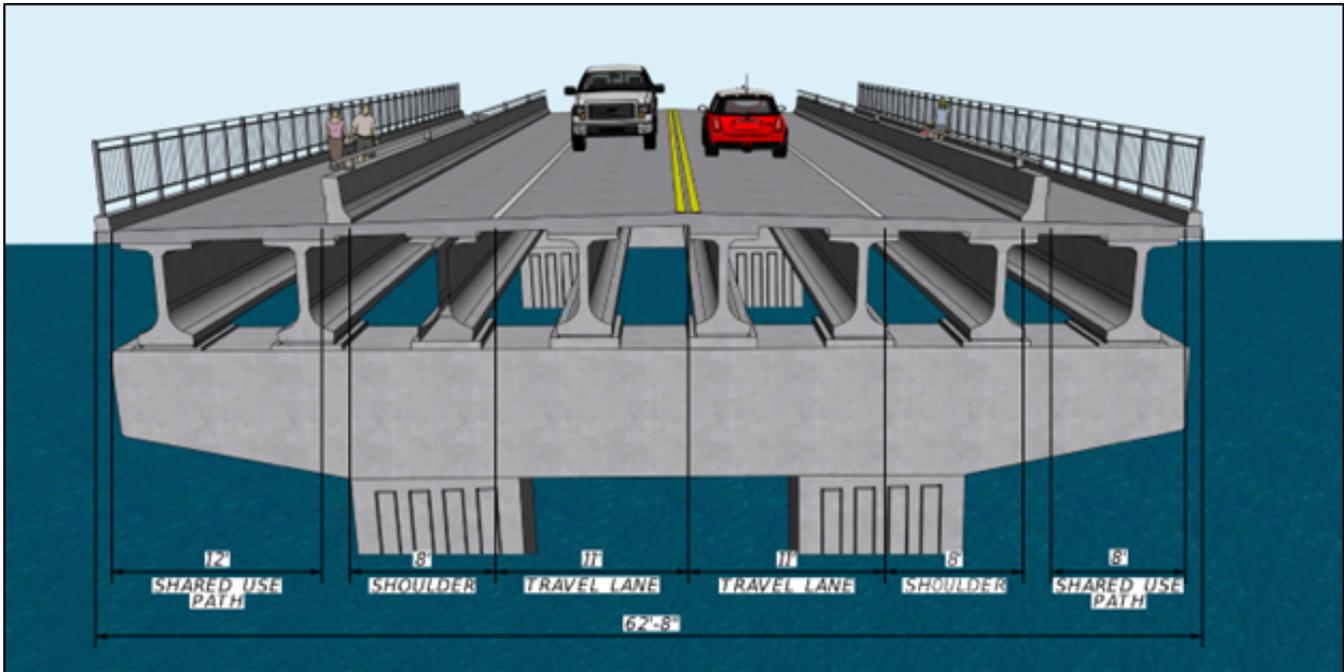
Proposed Typical Section for S.R. 789 Roadway
